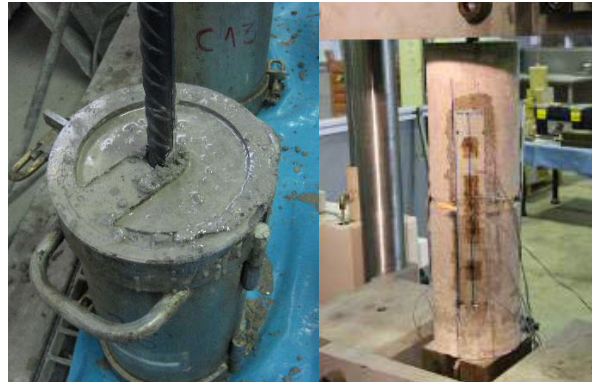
Concrete specimen with embedded steel bar (left) and fully mounted device (right).
